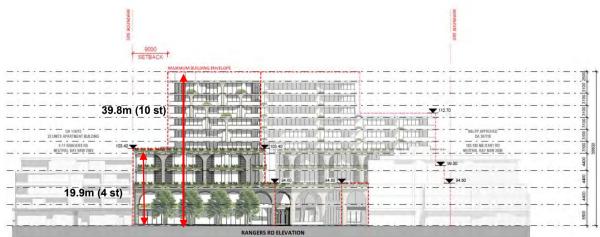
Applicant elevation plans – Rangers Road (source: Applicant's Architectural Plans, p. 19)
